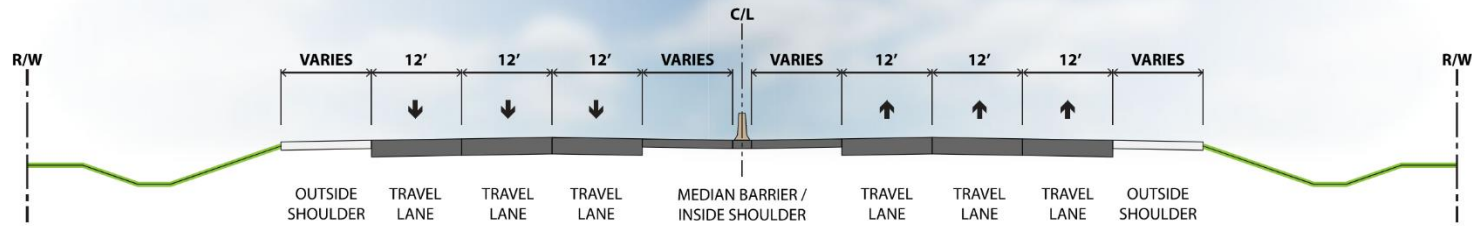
Typical Section of Collector-Distributor Roadways in 65 & 70E Spokes
